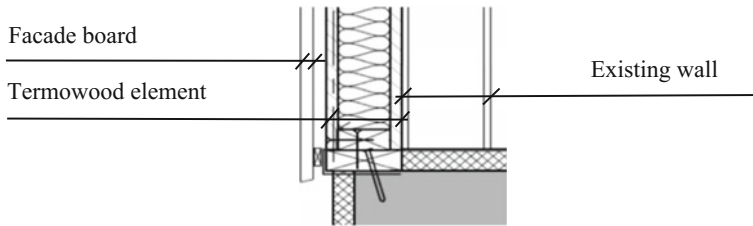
Wall section of renovation with Termowood elements and facade boards as external cladding
